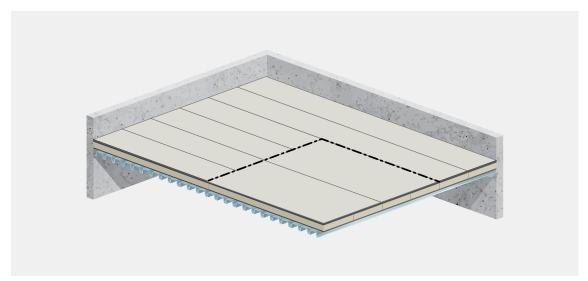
Layout UltraPly™ TPO panels in MEC system over steel deck
